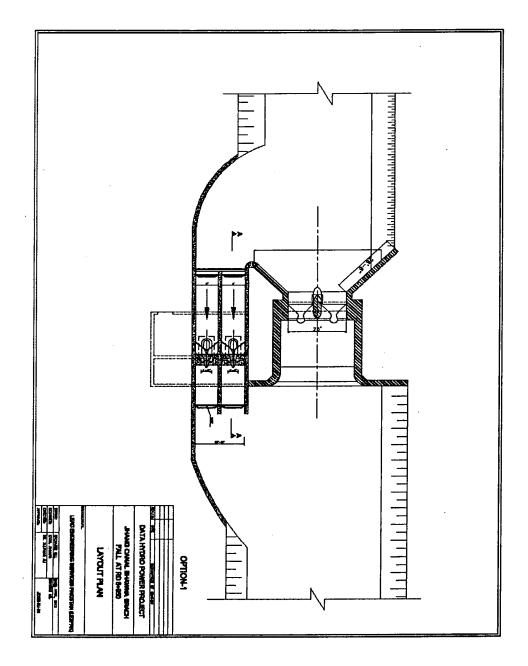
Fall at RD 8+950 (Option-1, Layout Plan)
